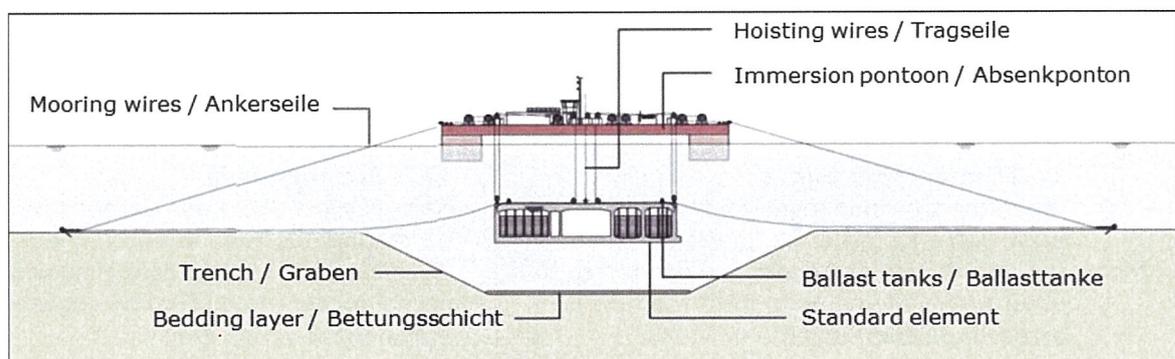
Immersion of a tunnel element from an immersion pontoon into the dredged trench with bedding layer.
